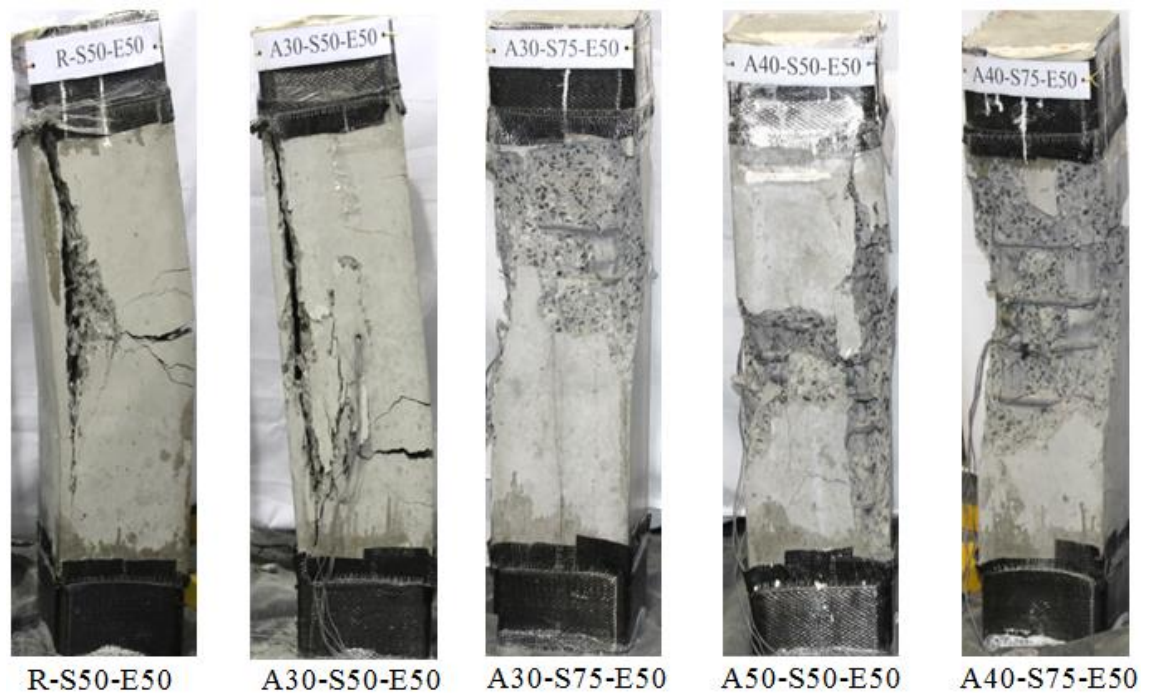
Behaviour of Specimens under 50 mm eccentric axial loads: Compression side
